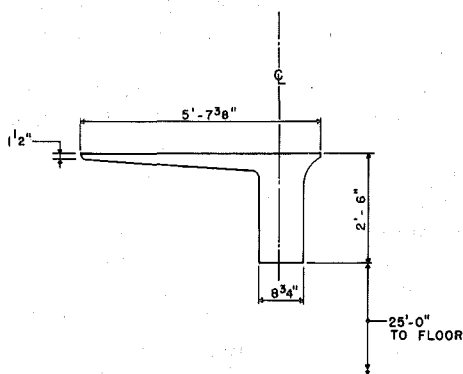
Dimensions of Half Tees (1 in. = 25.4 mm)
